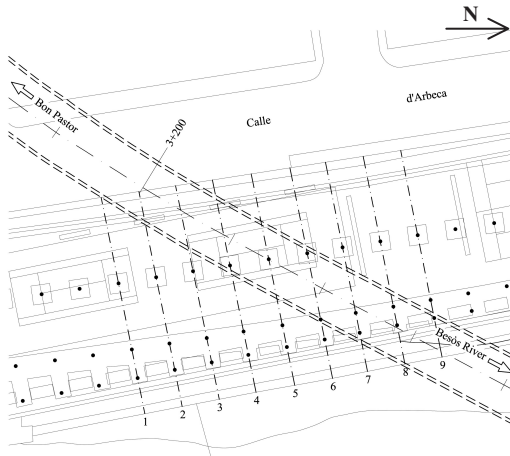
Plan view of the crossing of the motorway by tunnel construction.
